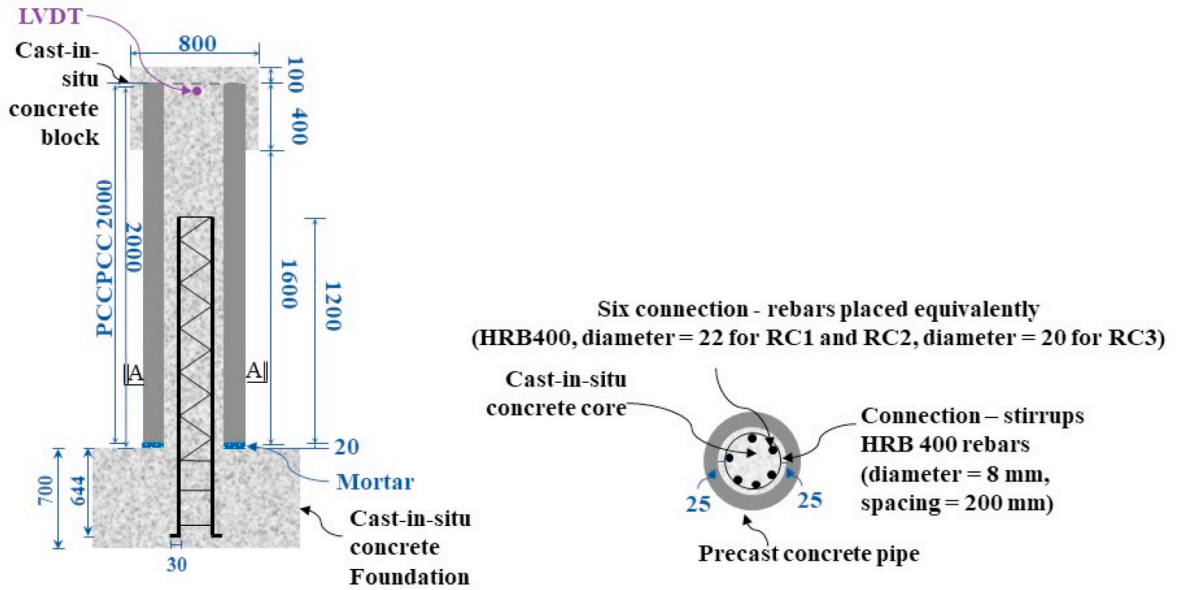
Schematic drawing of specifications of specimen under RC connection (unit in mm).
